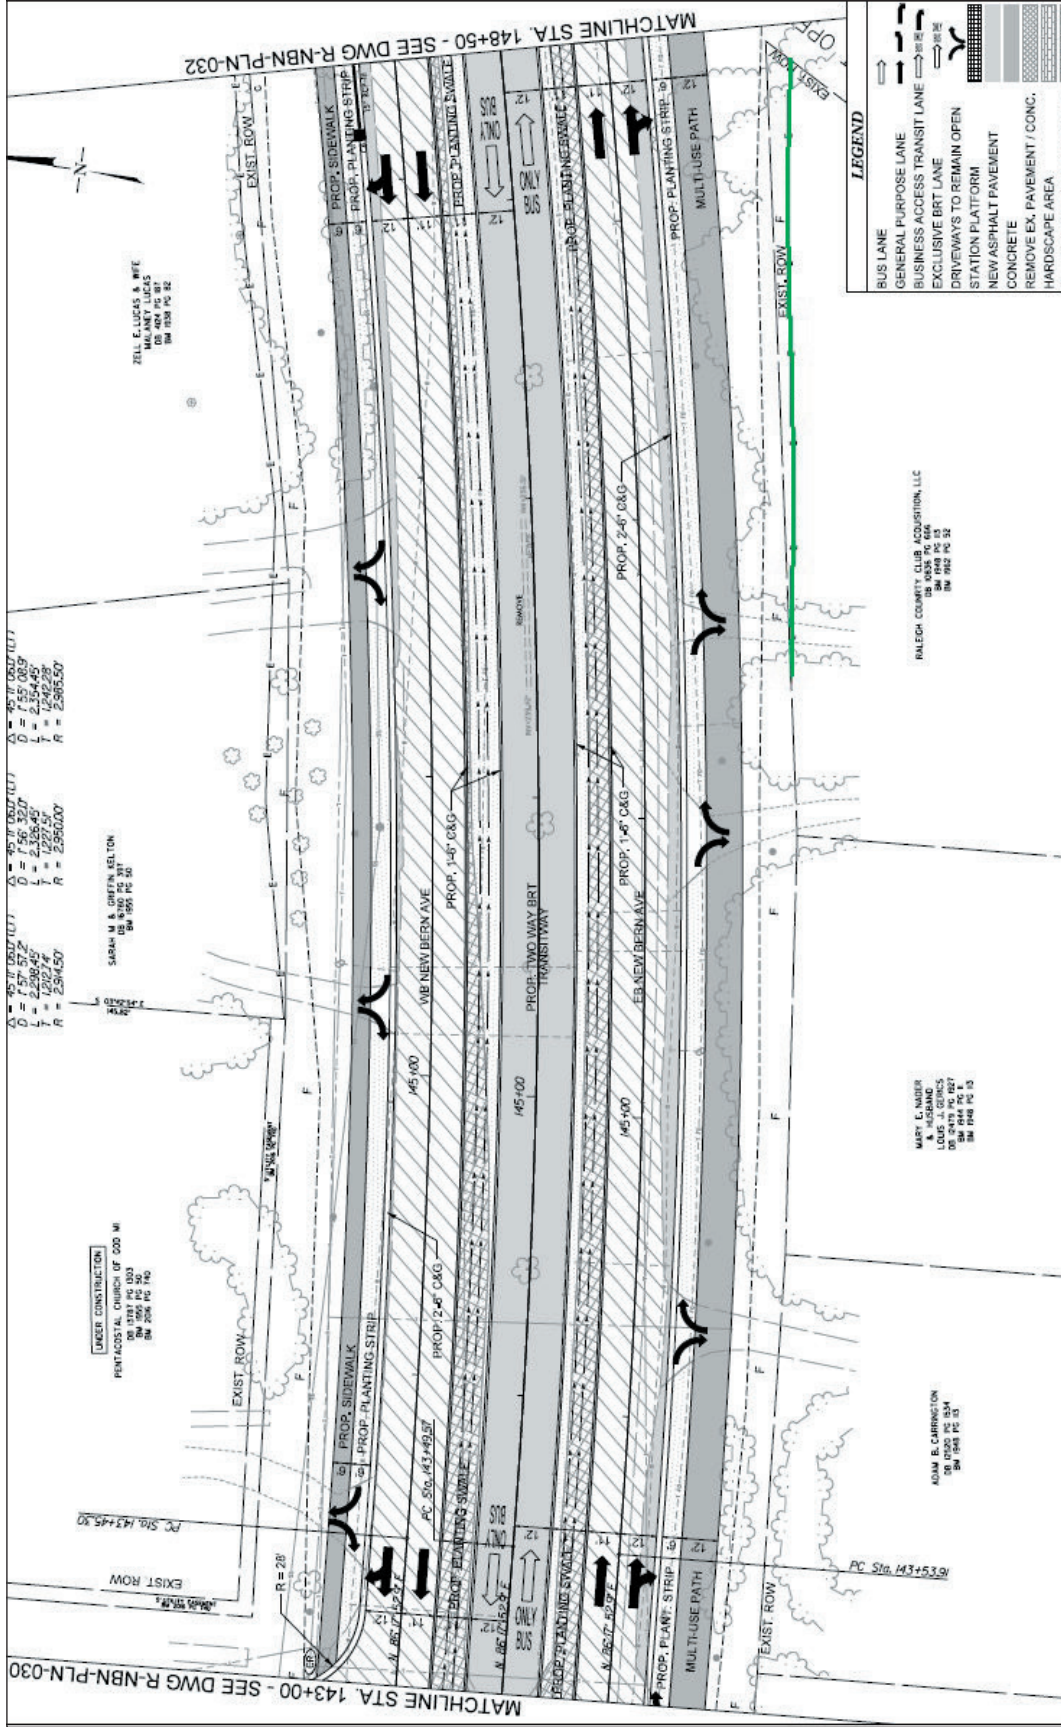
Temporary Construction Easements Shown in Green Wake BRT New Bern Corridor Preliminary Plans, Sheet R-NBN-031, 2020
